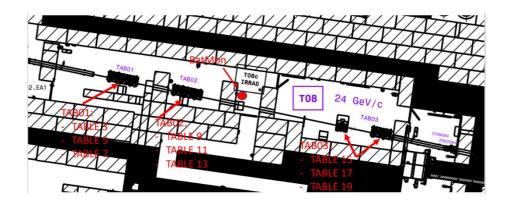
Layout of the IRRAD Facility. (Source: [5]).
